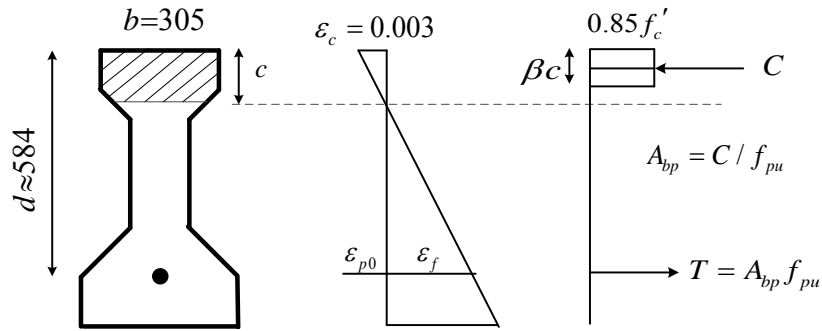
Balance failure for the AFRP prestressed girder
